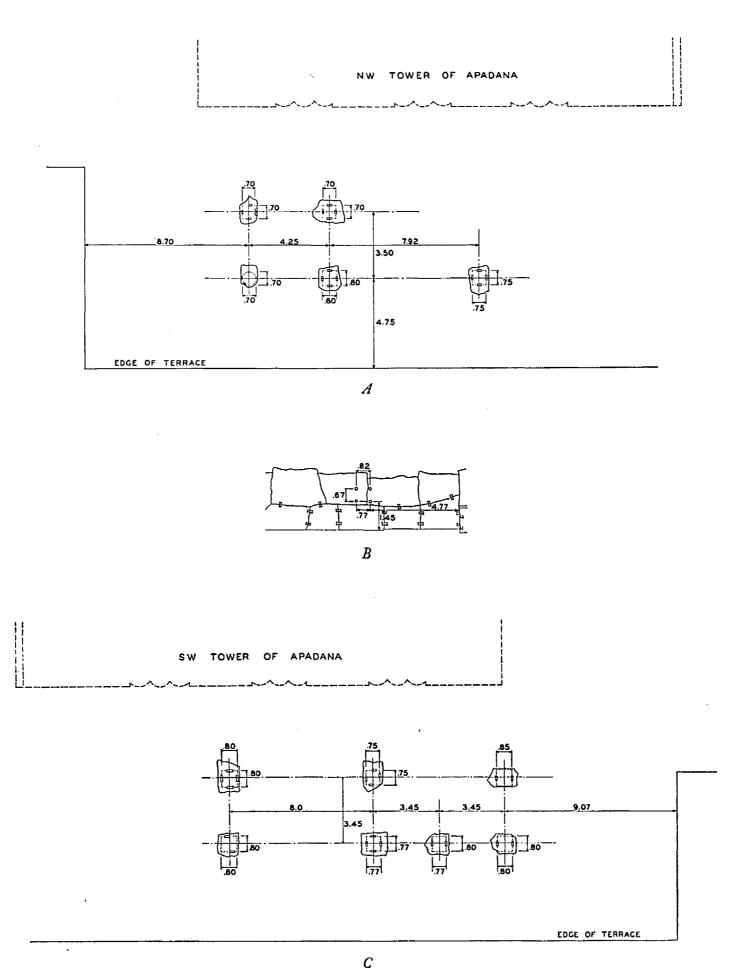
Apadana. Scale, 1:200. A. Column Foundations West of Northwest Tower. B. Depressions Aligned with Western Entrance. C. Column Foundations West of Southwest Tower
